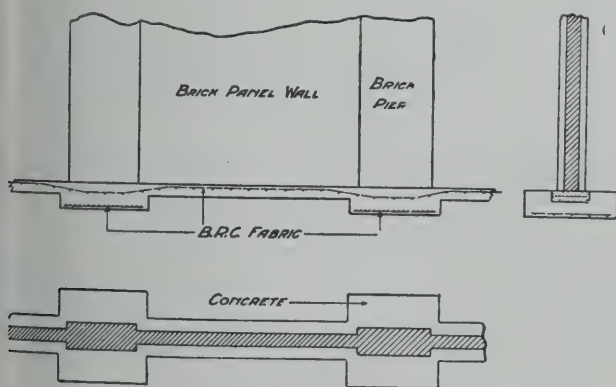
B.R.C. FABRIC IN FOUNDATIONS.
